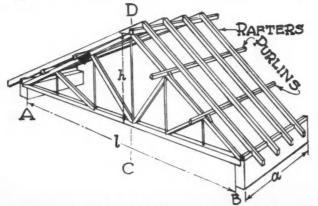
Roof Supported by Trusses, Purlins and Rafters.
